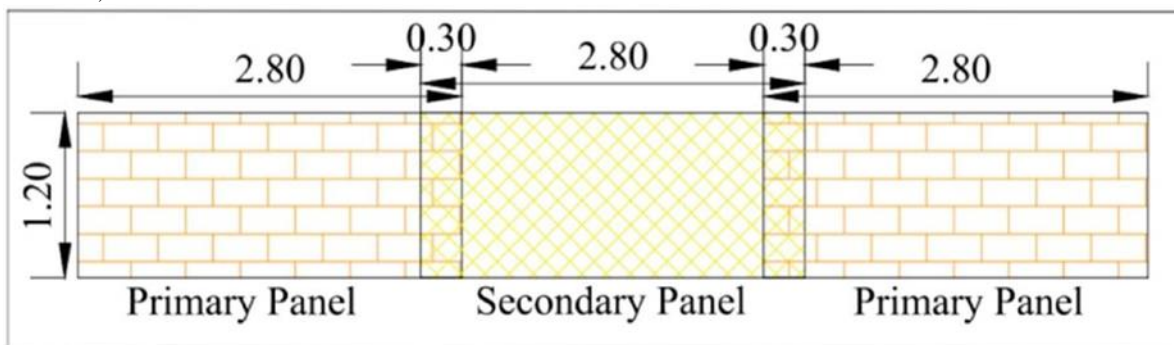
Panel configuration of cut-off wall showing primary and secondary panels along with overlaps
